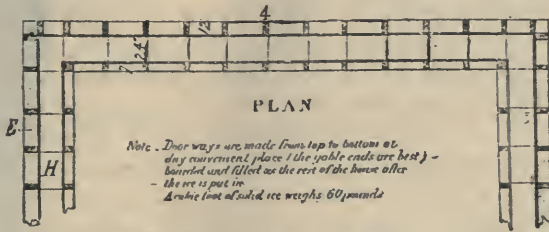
SECTIONAL PLAN OF MODEL ICE HOUSE.
